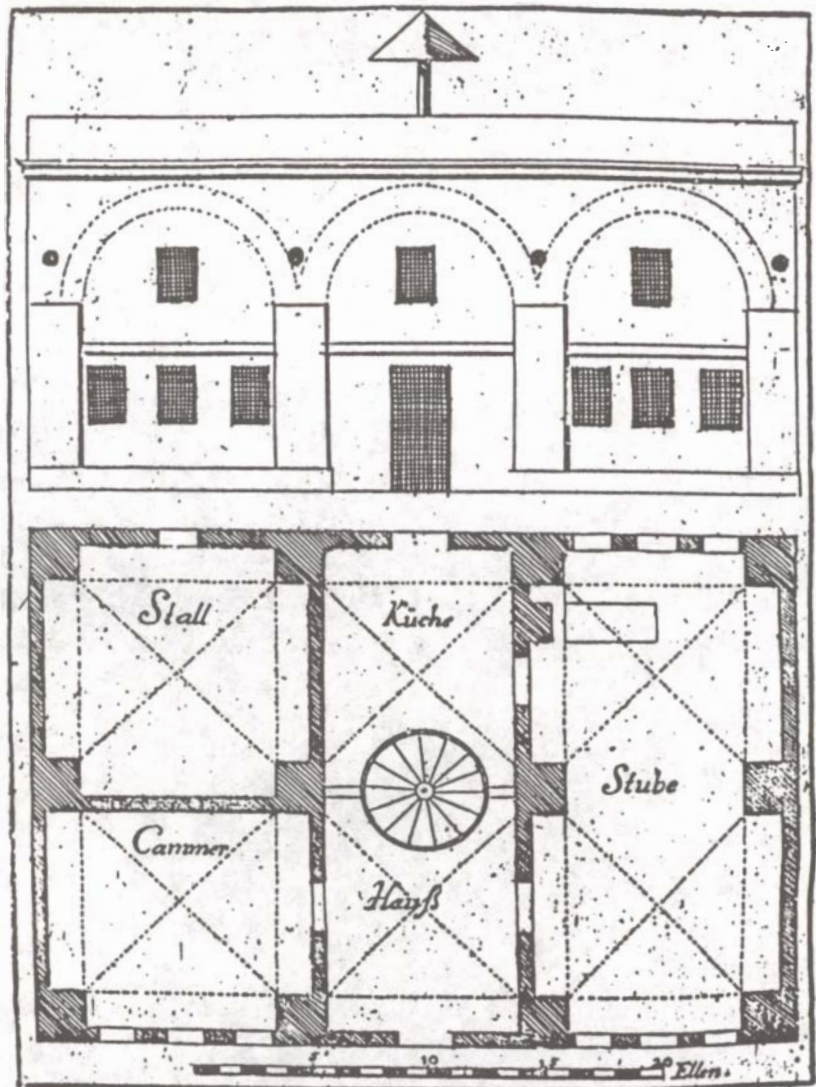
Floor plan and elevation of a "fireproof farmhouse", as planned by the Saxon architect Richter in 1736. Walls and pillars were to be made of solid clay, the vaults of stone. The roof area was to be filled to a level of about one metre with clay and fertile soil and planted as a garden. The cone-shaped roof to the circular stairway was to have been mounted on the newel of a spiral staircase and could be lowered in inclement weather. [3] (Stube = lounge; Hauß = hall; Cammer = chamber; Stall = stable; Küche = kitchen).
